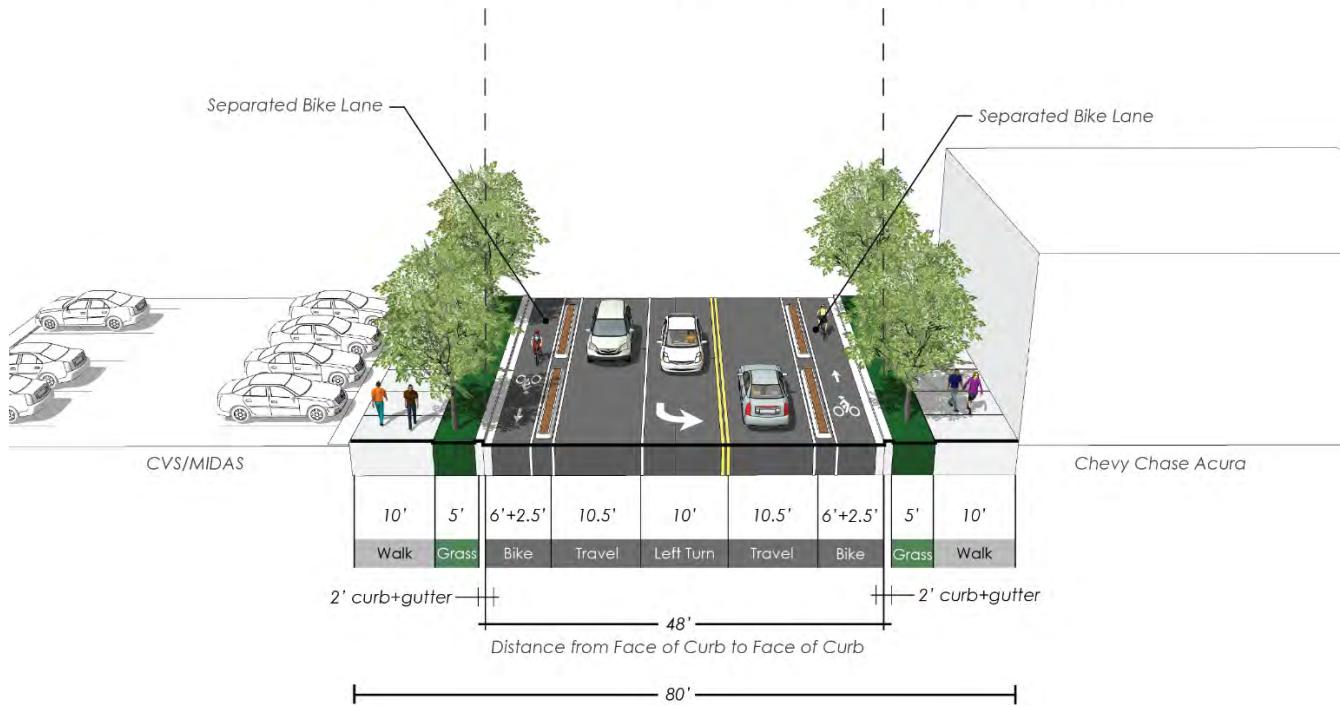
Bikeway Facility Type Option 2 - One-way Separated Bike Lanes
